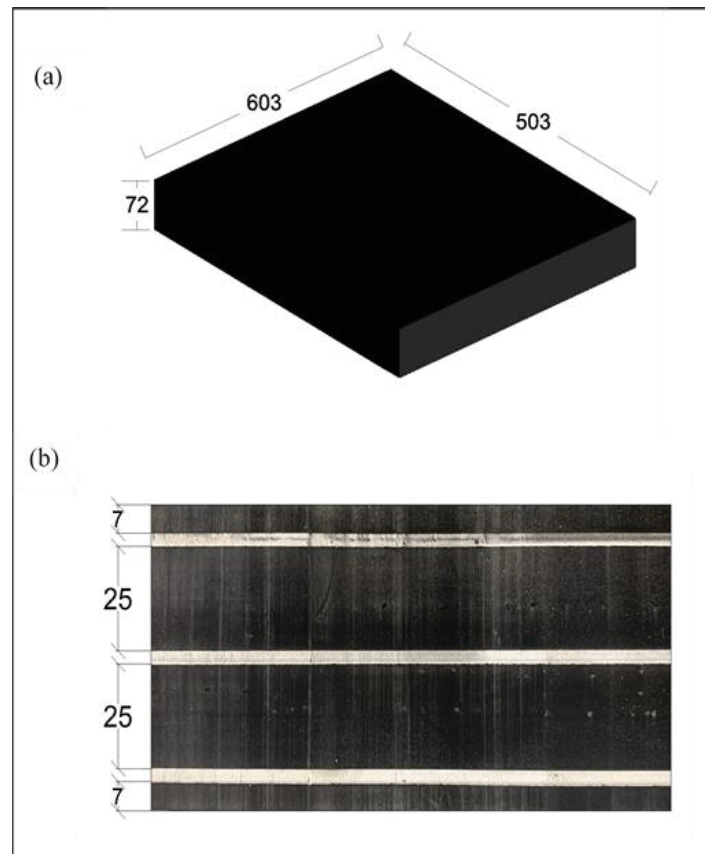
(a) Dimensions of original CHB bearing D4.28 (Series 3), (b) transverse section
